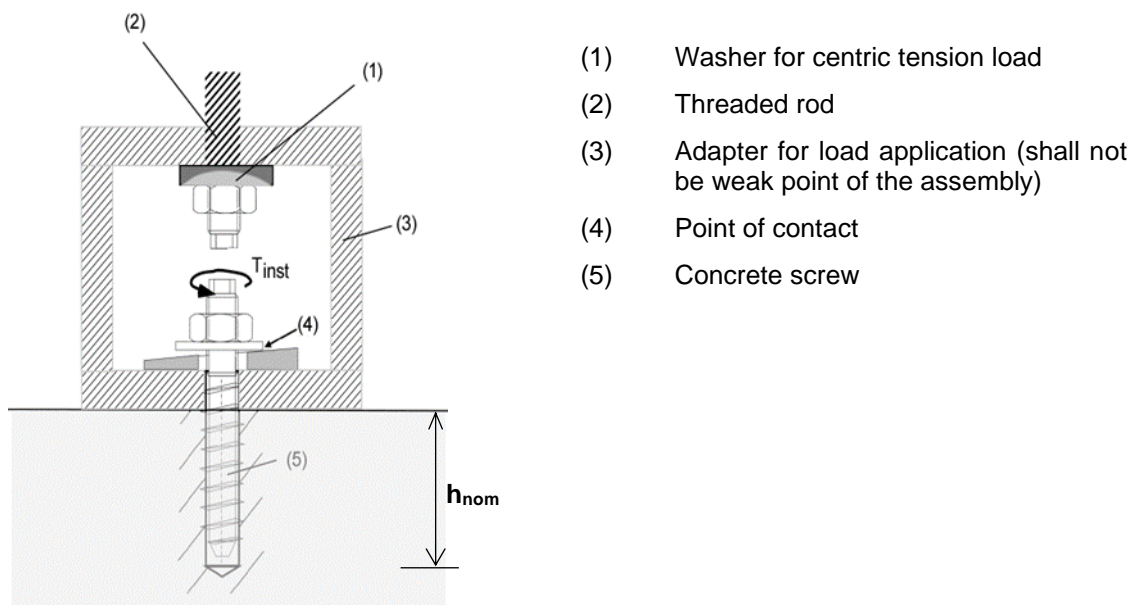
Example of load application to concrete screws via adapter in tests F4 with repeated loads
